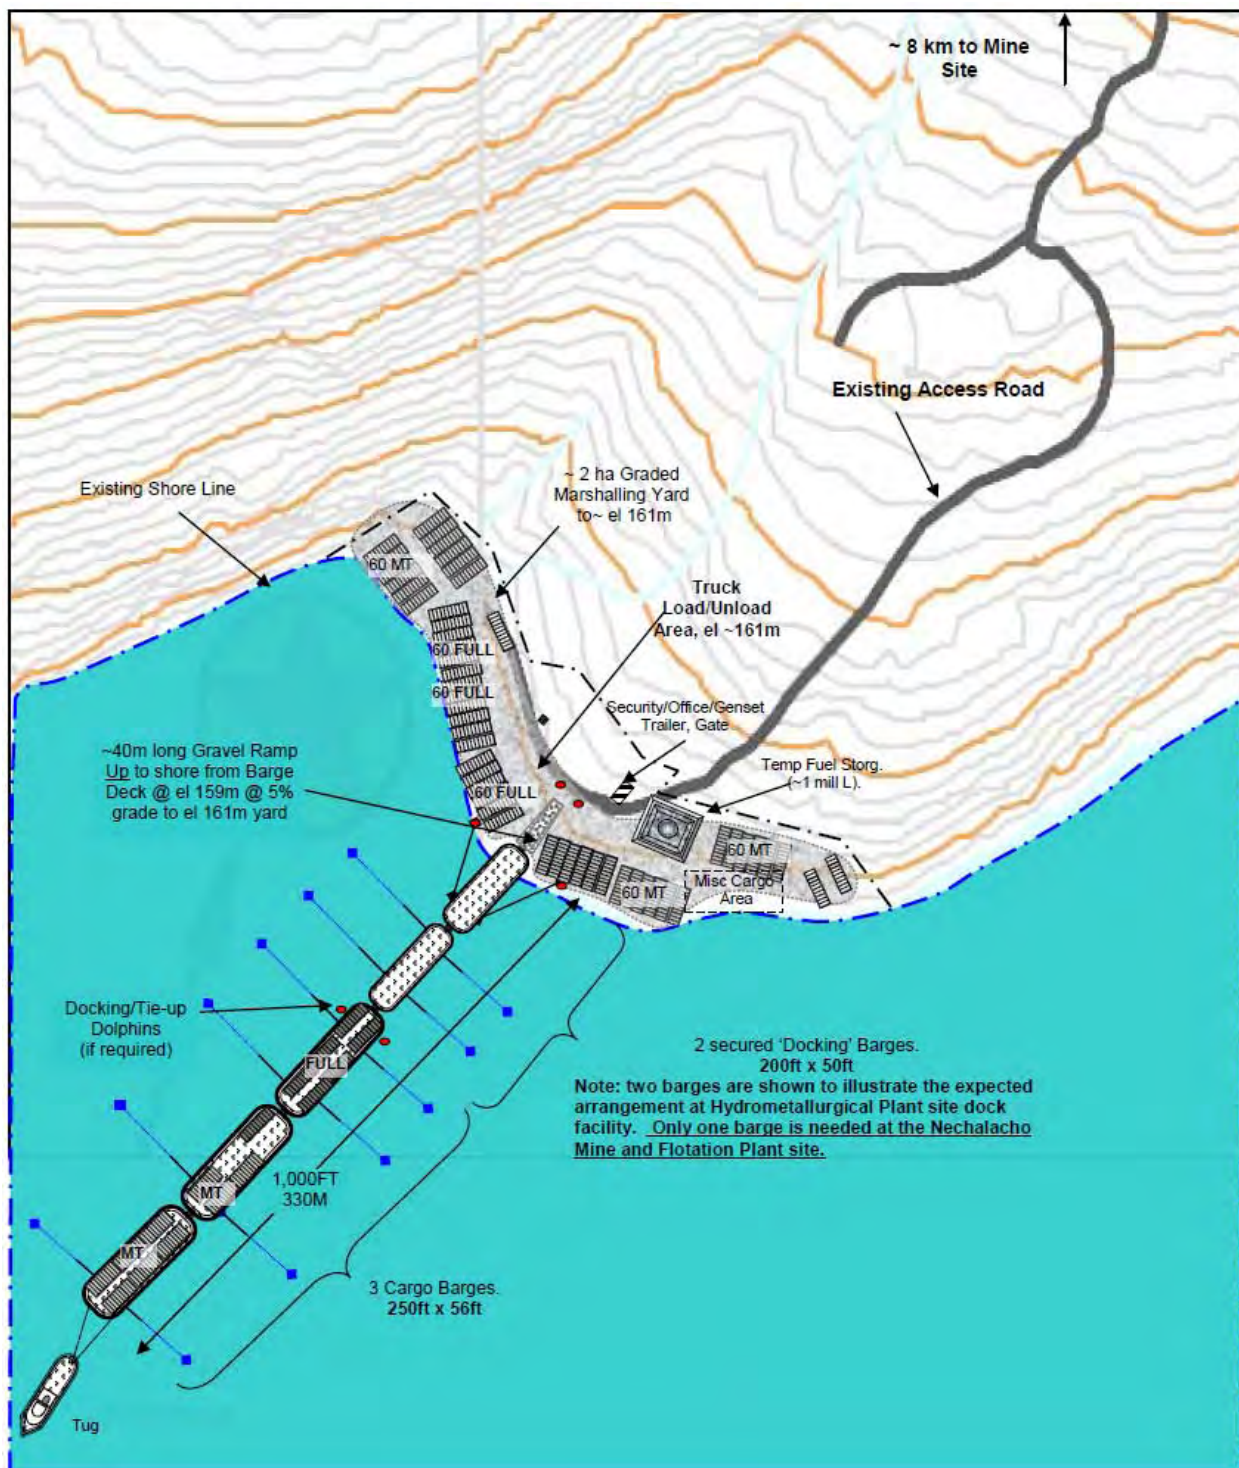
Nechalacho Mine and Flotation Plant Site Dock Facility Layout
